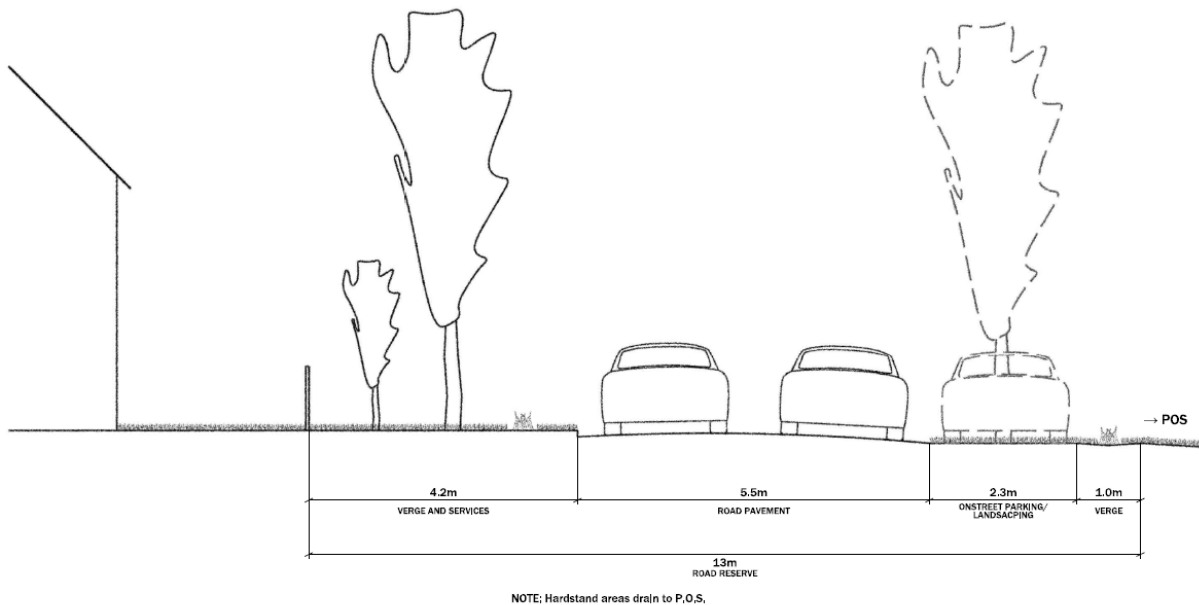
Cross section for typical road reserve for access streets facing POS
